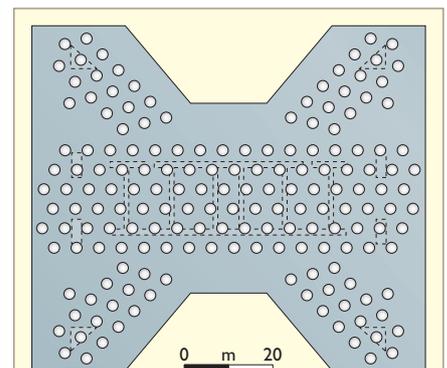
Layout of the 172 no. 2.5 m diameter bored piles and 5.5 m thick raft
